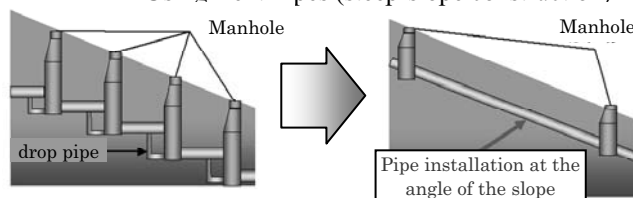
Variable Slope Sewer Construction Using Bent Pipes (steep-slope construction)
